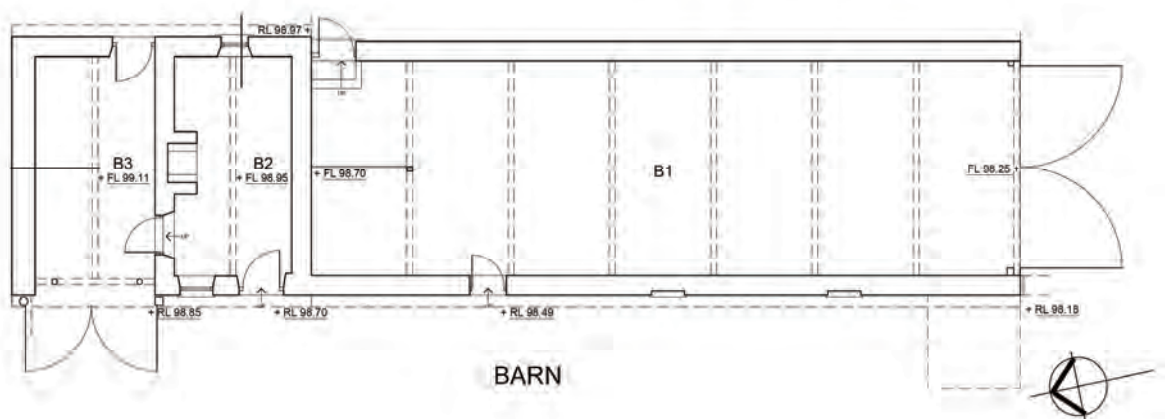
222: Measured floor plan of Barn. Source: LSJ Architects.
